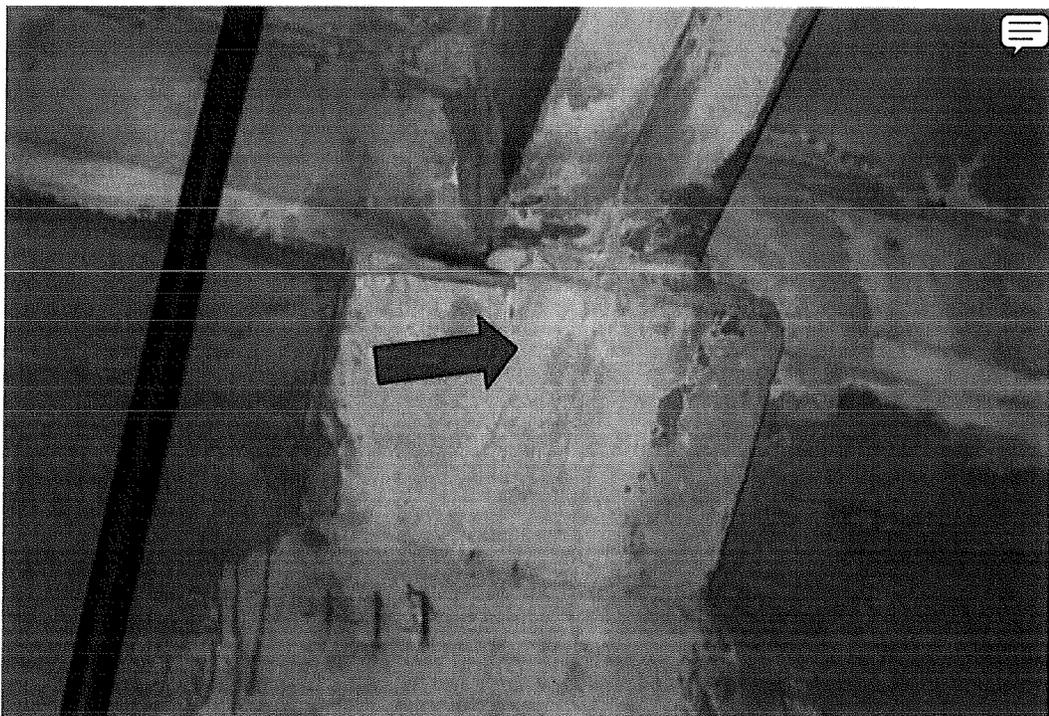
Cracked and hollow sounding concrete encasement of steel corbel. Along Column Line U5, between Column Lines 11 & 13 at the underside of Parking Level 7. (Approx. 4 SF)
